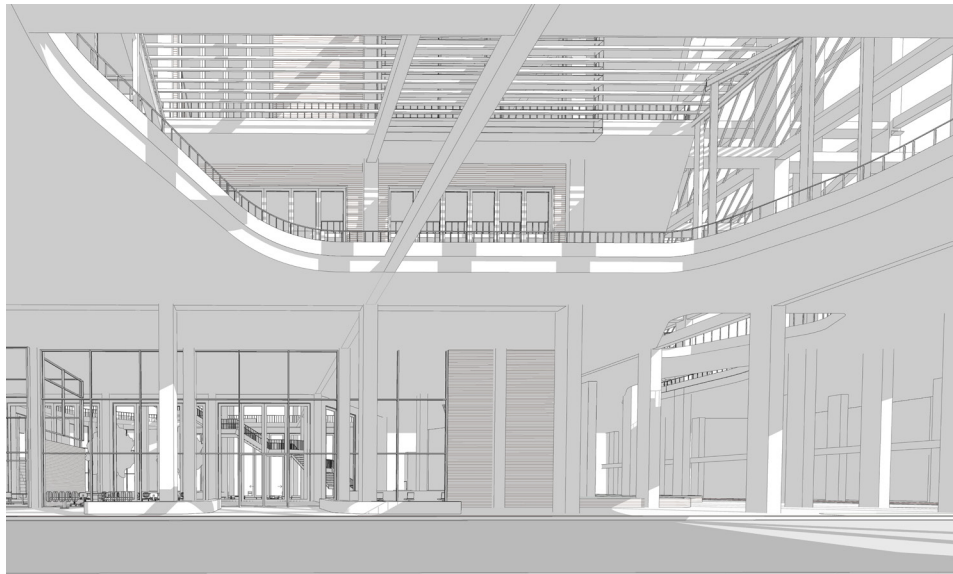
GROUND FLOOR APPROACH EAST ENTRANCE (AUTHOR 2021)
